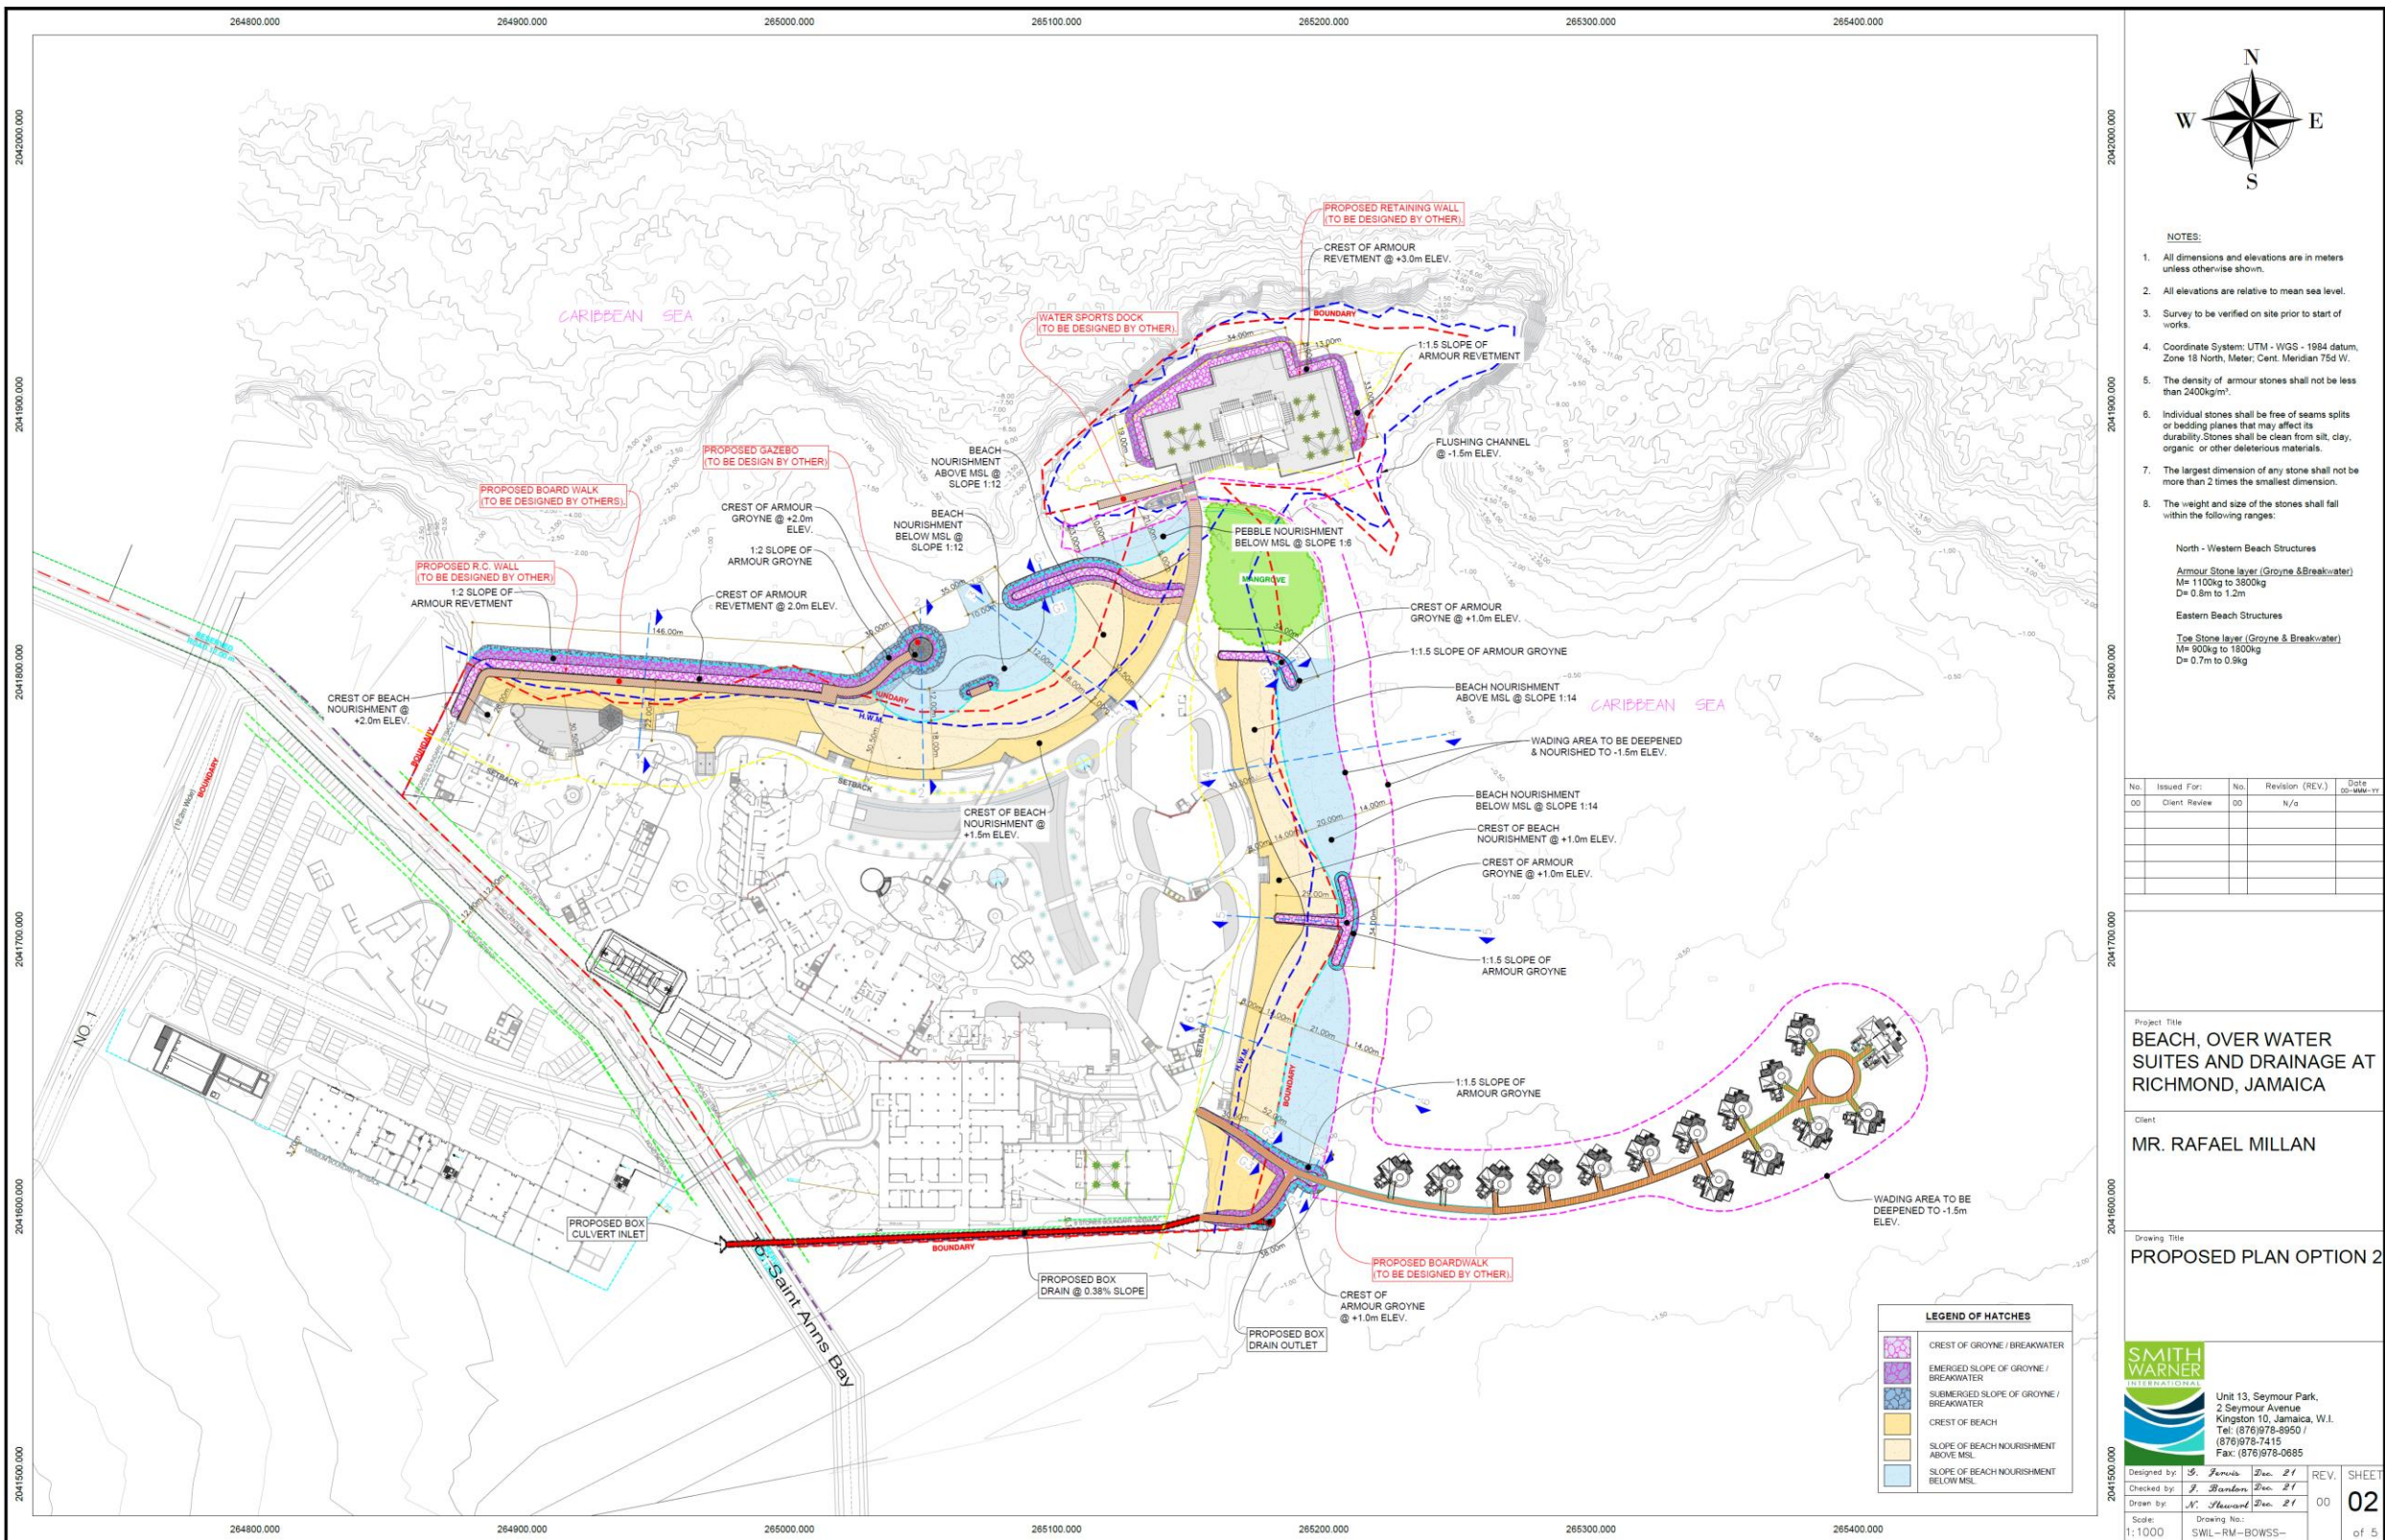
Alternative 7 layout showing reduced wading area and shorter overwater room boardwalk
